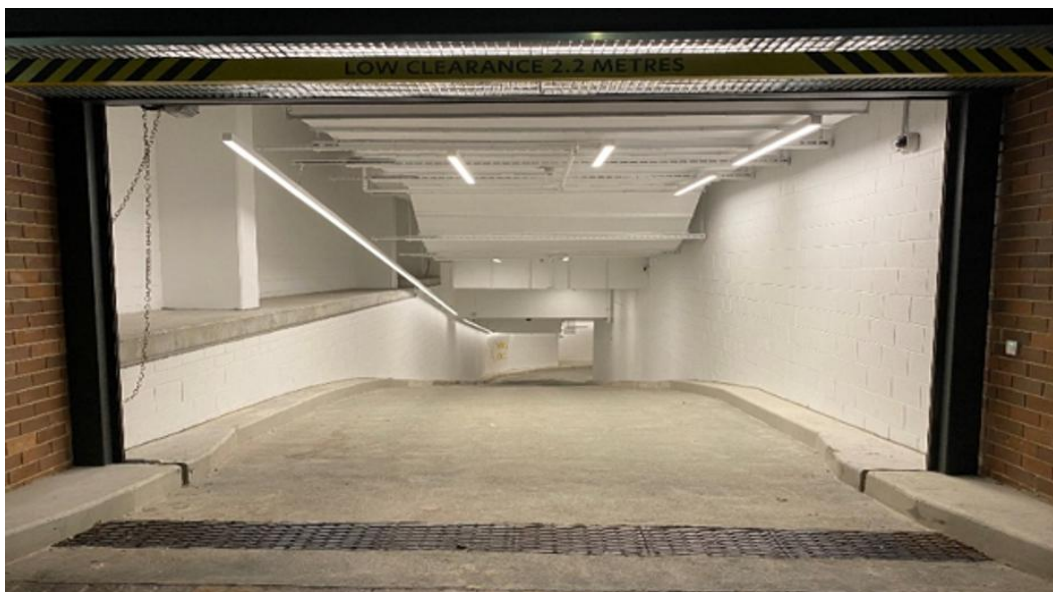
indicative example of internal basement lighting wall and ceiling 'saturation' - Harris
